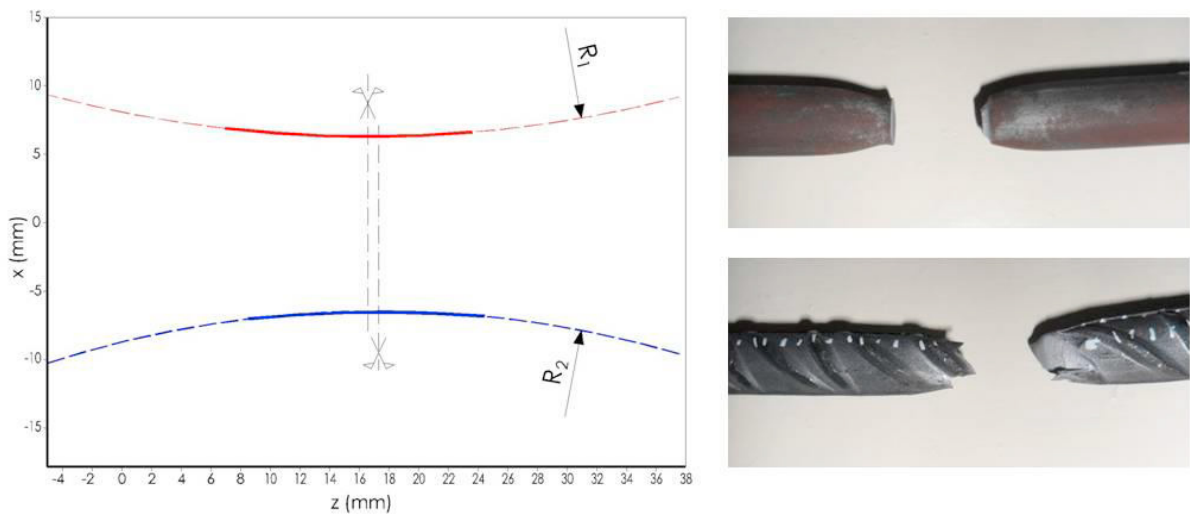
a) Neck profile of a rebar specimen , b) fracture of round (right-up side) and rebar (right-down side) specimens
